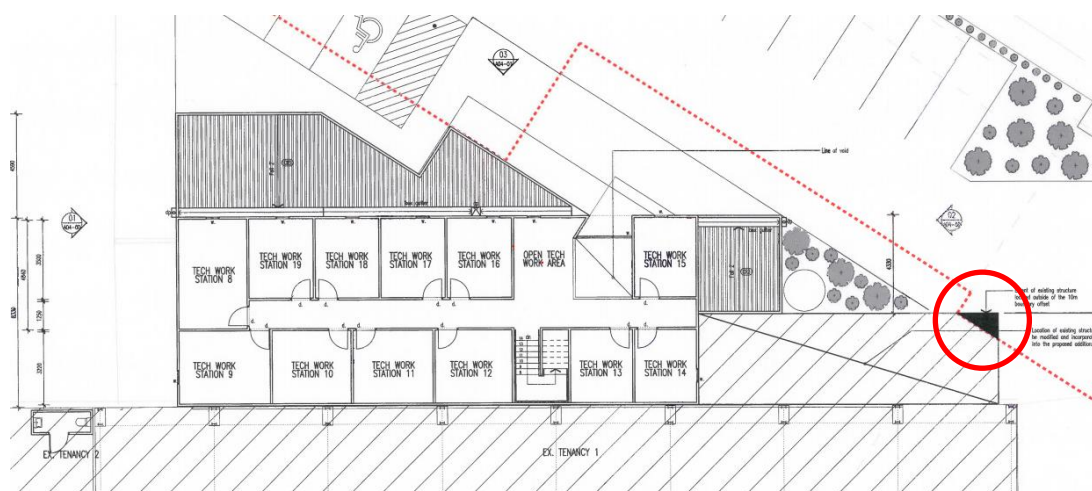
Proposed site plan with section of building located outside the 10m setback.
